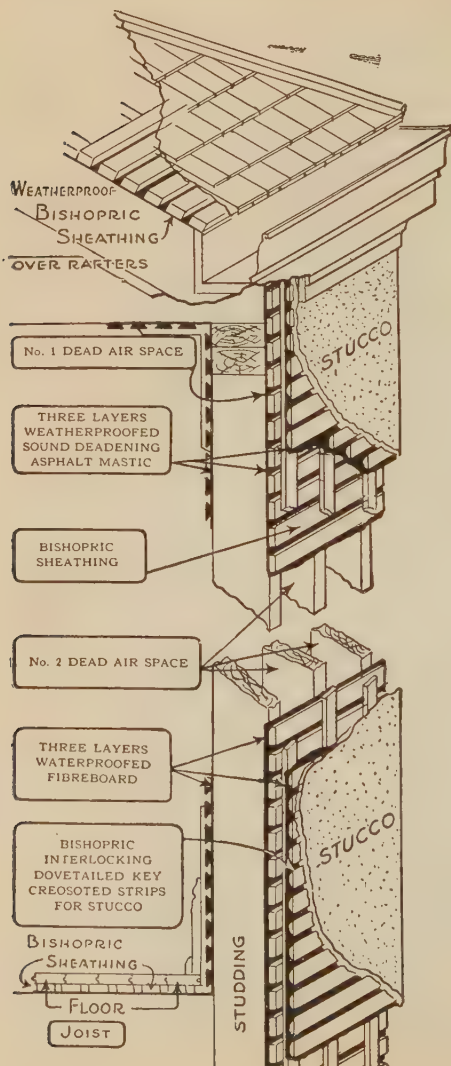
,138.—Stucco house construction as recommended by Bishopric, showing exterior stucco walls over two layer wooden lath and furring, interior stucco walls over wooden lath. A study of the illustration shows three layers of asphalt building paper and two layers dead air space.
